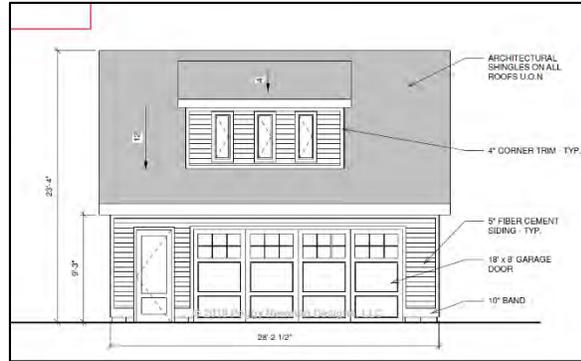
Front elevation of a proposed outbuilding at 1210 Stratford Avenue, with ridge height of 23'-4" and eave height of 9'-4".
